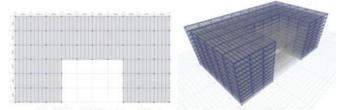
Model4:Buildingwith SecondaryBeams: Plan &3Dmodel
